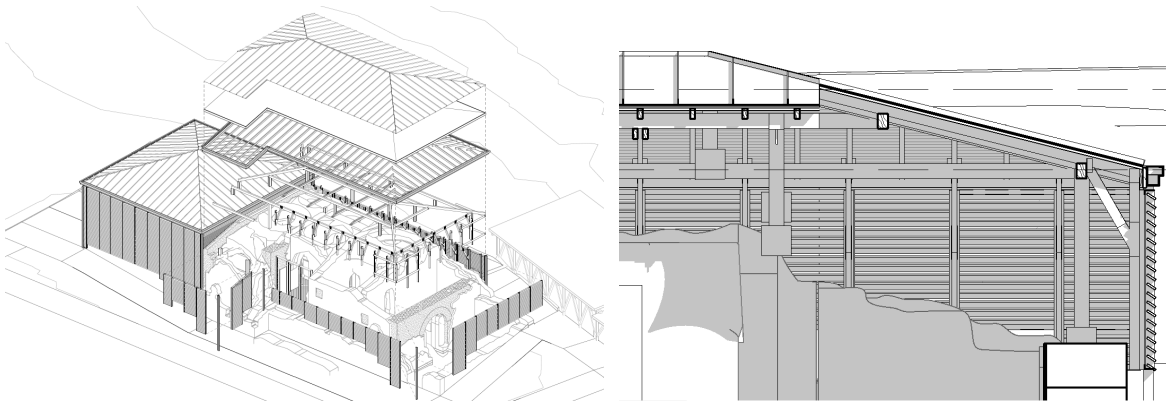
(a) Roof displacement 3D view, section, (b) Same place 2D drawing exported to AutoCAD
